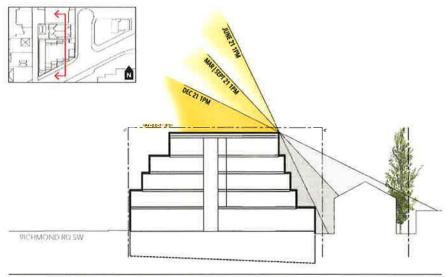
NORTH-SOUTH SECTION (LOOKING WEST)
